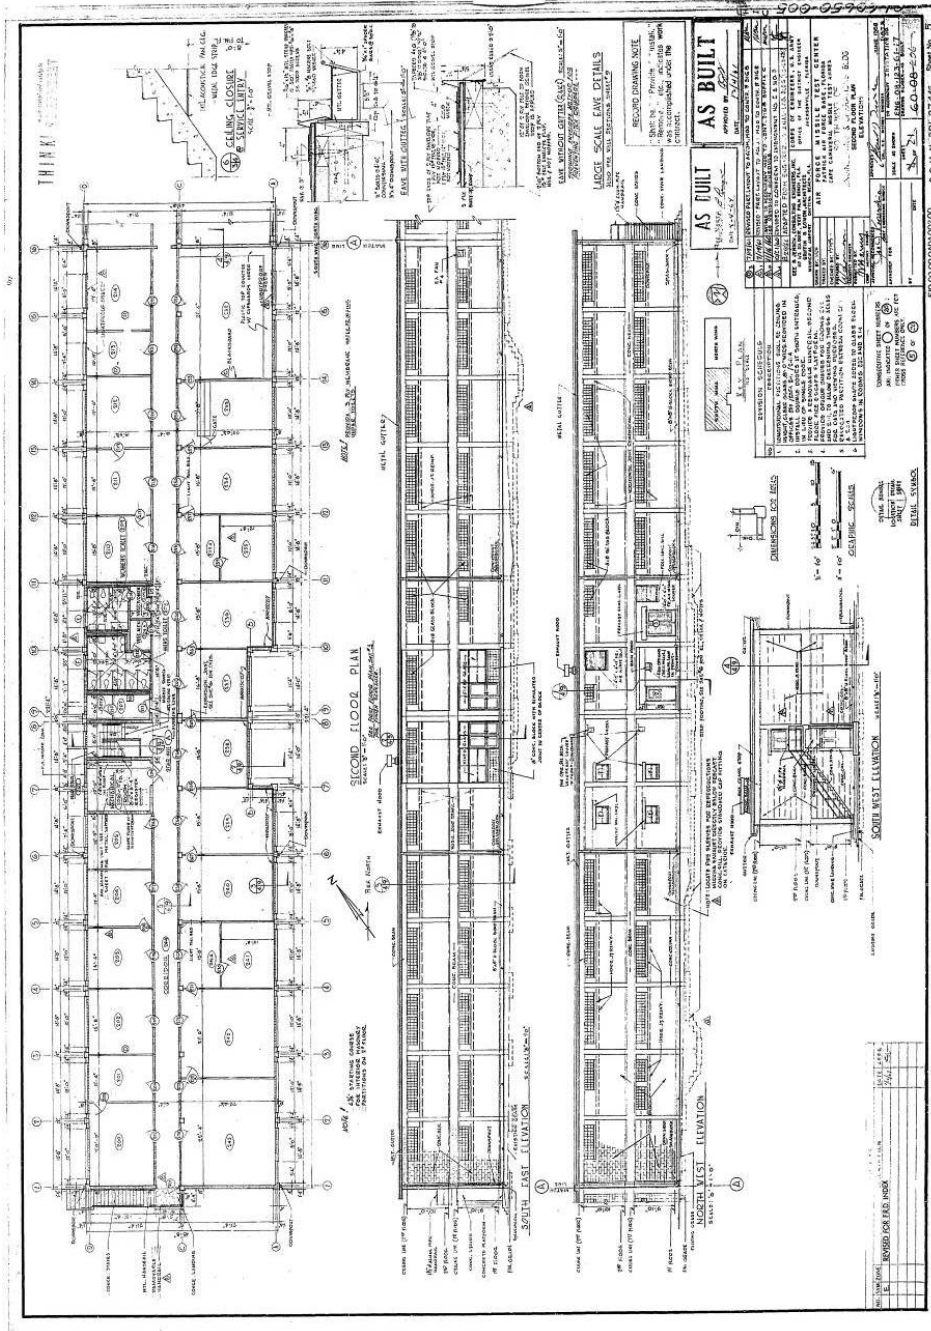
Griffin & Gomon, South Wing of the Engineering & Operations Building, Second Floor Plan/Elevations, June 1958, Sheet 5.
